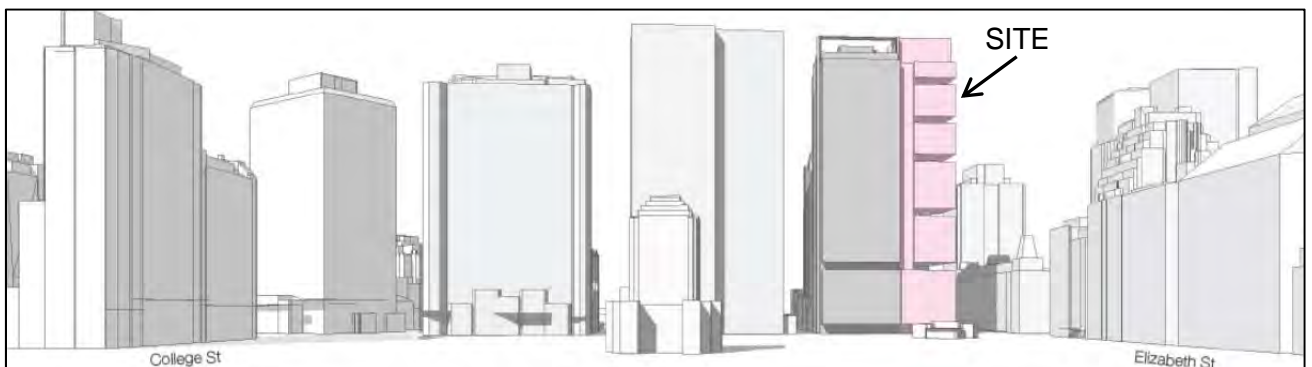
Indicative envelope with the upper 2 levels setback to align with the architectural roof feature of 'The Hyde', as viewed from Hyde Park
